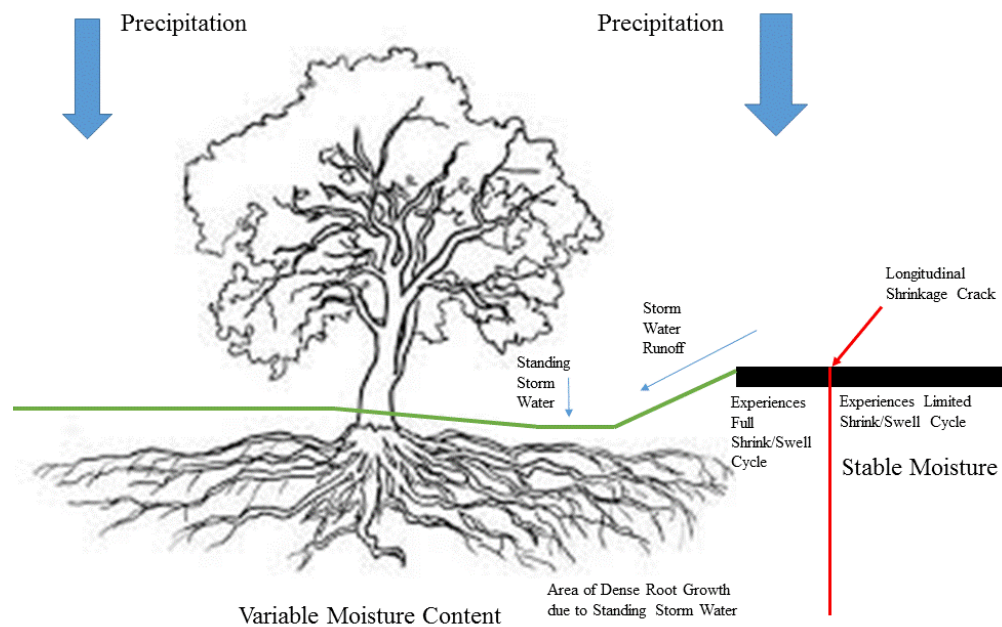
Driving Factors behind Pavement/Slope Damage near Boring B5.0 MP 52.85
